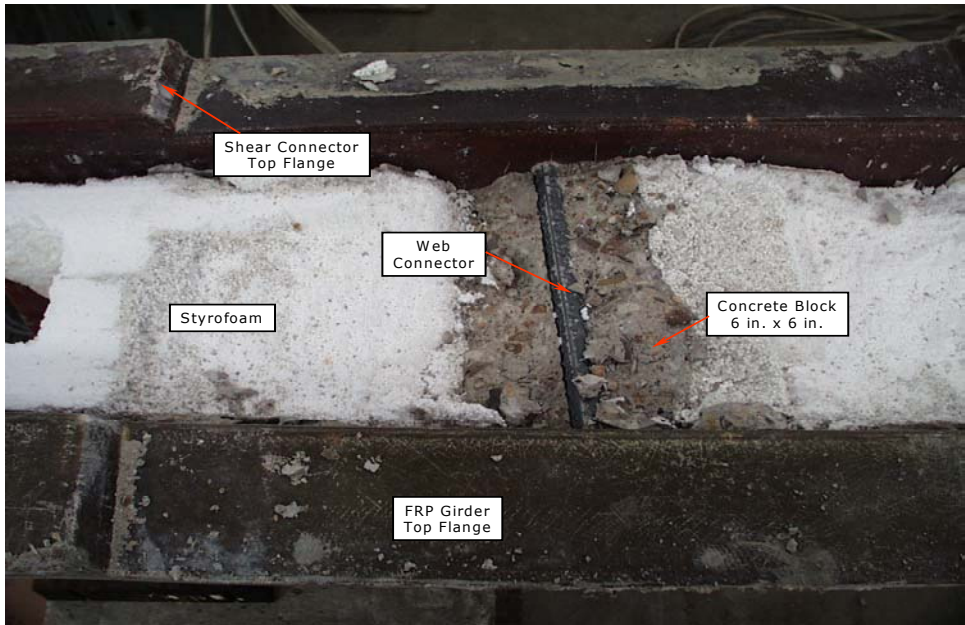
Shear Failure at Deck-Girder Interface at South End.
